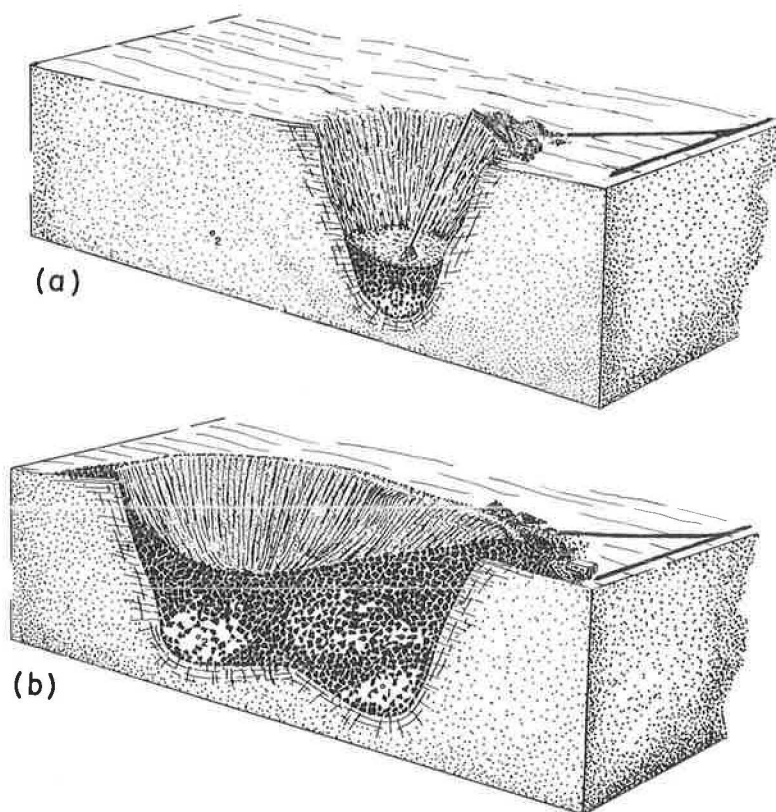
Multiple explosion quarry: (a) rubble mined out after first explosion, and (b) quarry after second explosion with rubble not yet mined.
